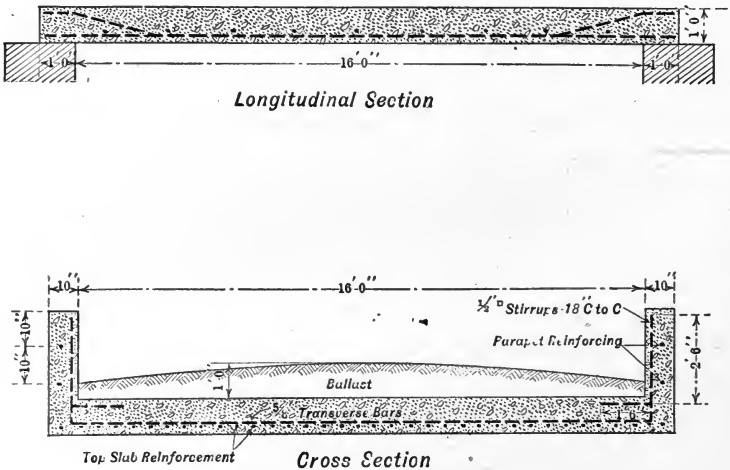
Typical Reinforced Concrete Slabs for Highway Culverts, Office of State Highway Commission, Richmond, Va.
